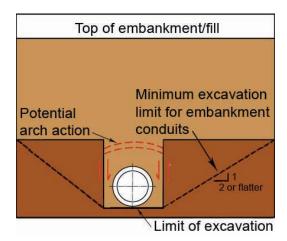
Arching action of a negative projecting conduit. Negative projecting conduits should not be used for embankment conduits. For an embankment conduit, an excavation with 2:1 side slopes or flatter should be used. This causes the conduit to behave as a positive projecting conduit. (Note: This figure is not intended to show all the design details required.)
